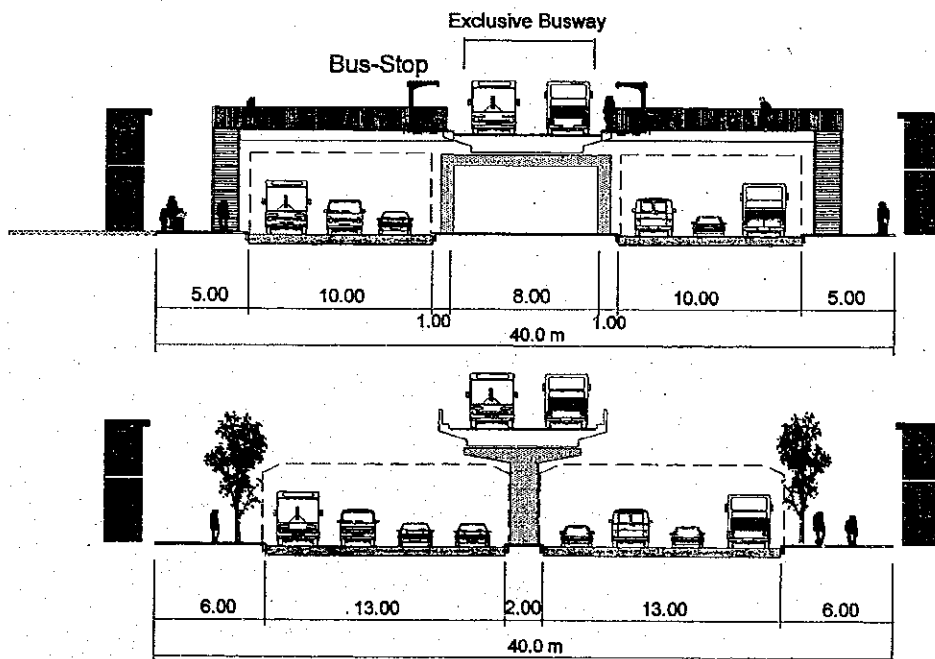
Typical Cross Section Of Viaduct Busway on Avenida Caracas
